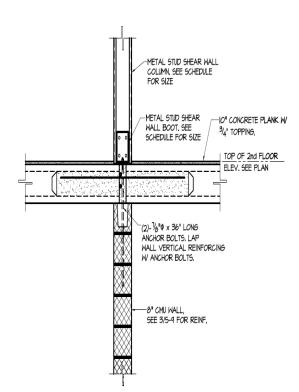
Second floor metal stud wall bearing on First floor CMU bearing walls
